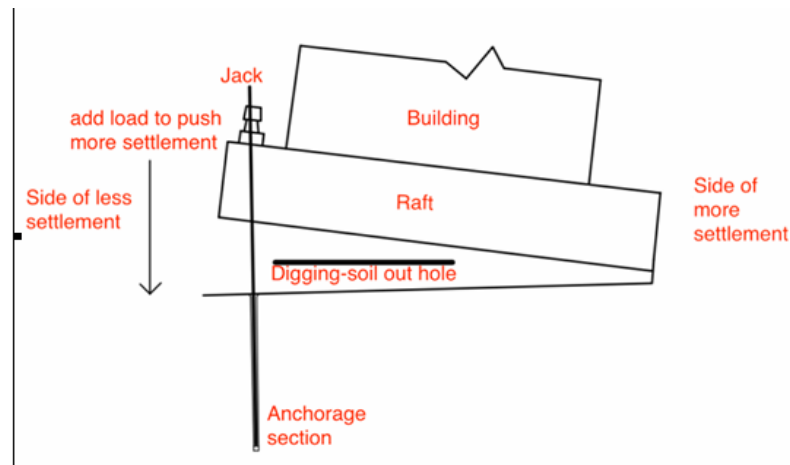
The schematic diagram of the underground excavation of Tower of Pisa
